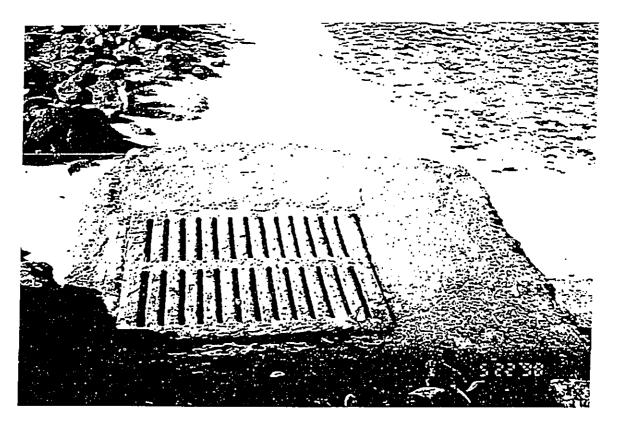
Elepaio Street Drainage Easement (View from Kahala Avenue)
